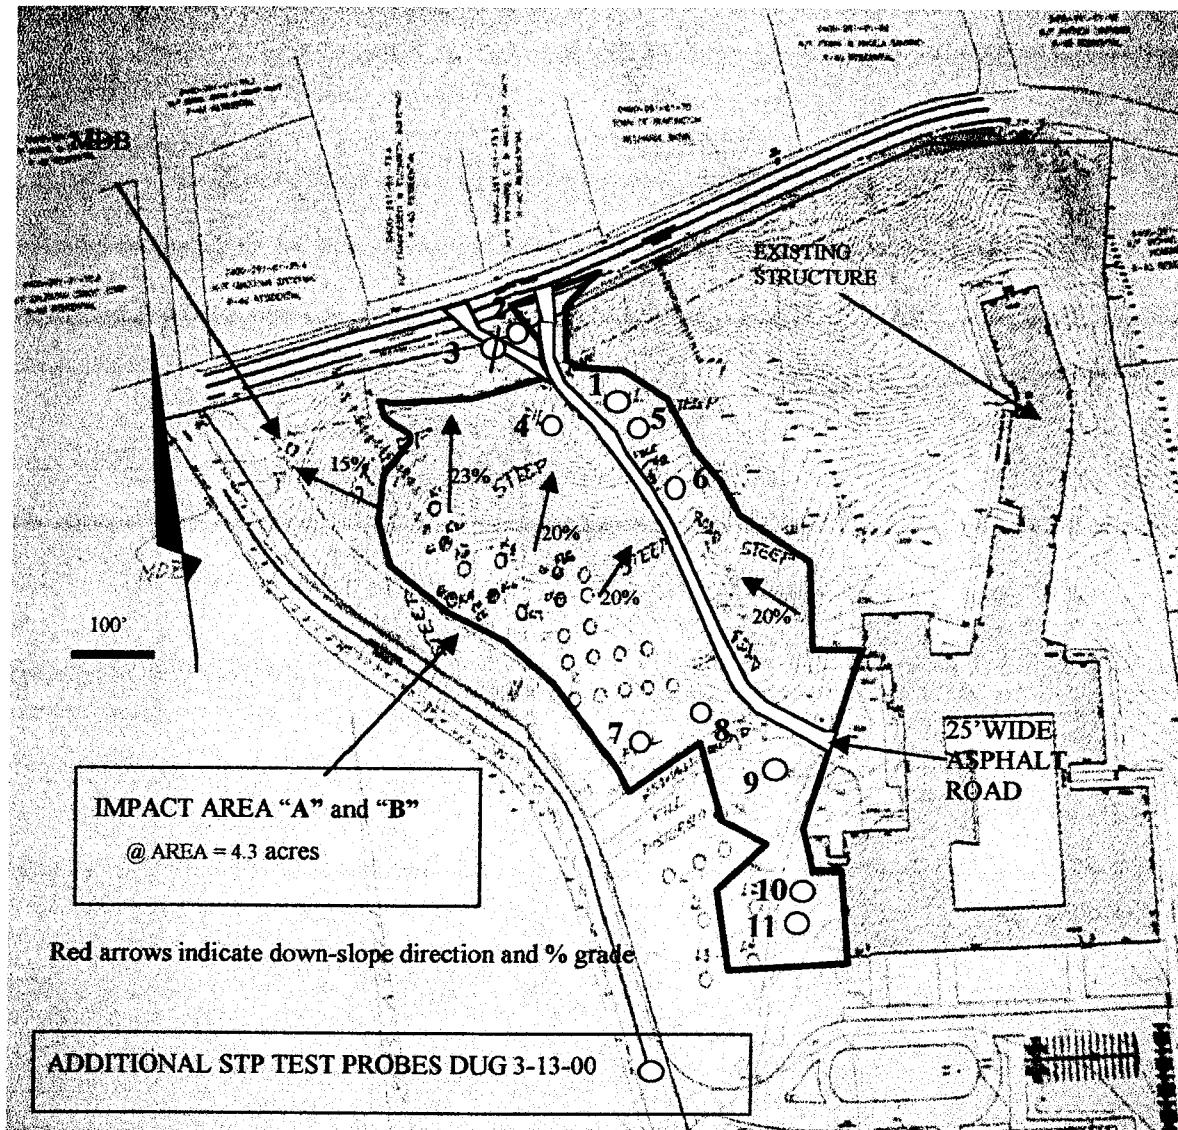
The proposed construction site at Half Hollow Hills Road and Burr Road at Five Towns College. Approximately 4 acres of impact area are outlined (Areas A and B of Stage IB CRA report. Additional shovel test probes are figured as numbered white circles (dug 3-13-00). Percent grade is noted in black letters with red arrows for slope direction. Base map is a section of the 6-24-96 Nelson and Pope plan of Five Towns College Expansion Site.
